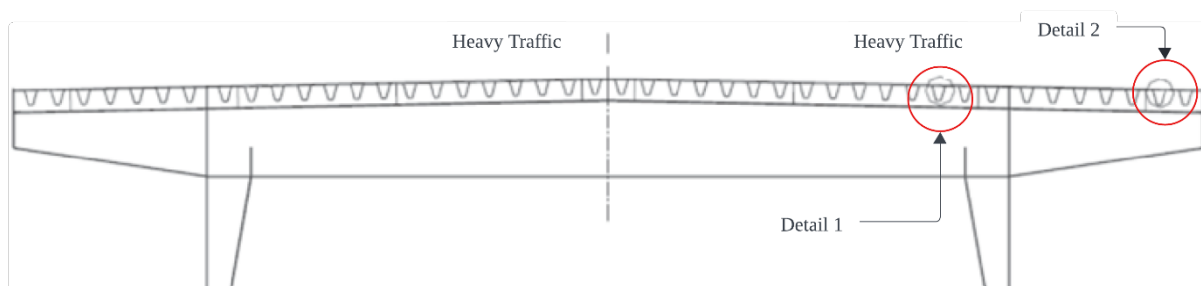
CROSS VIEW VAN BRIENOORD BASCULE BRIDGE (ROMEIJN, 2006).
